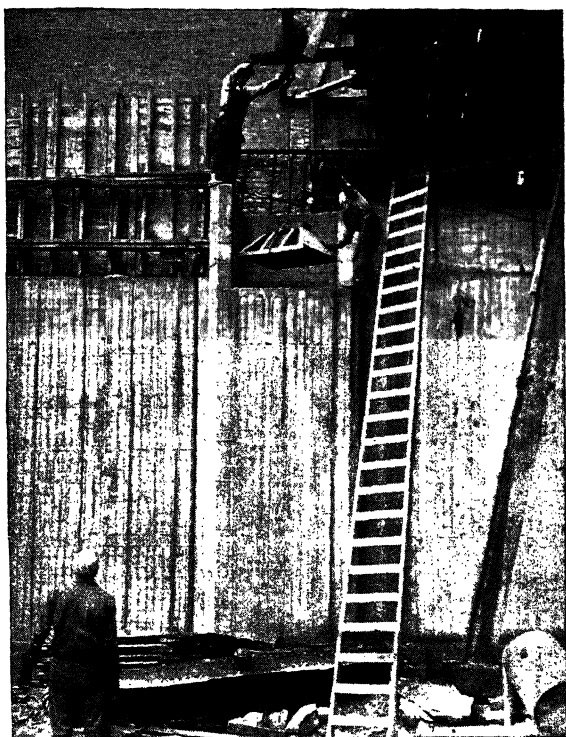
Setting a bearing for a steel bridge over the New York approach to the Lincoln Tunnel, New York City.
